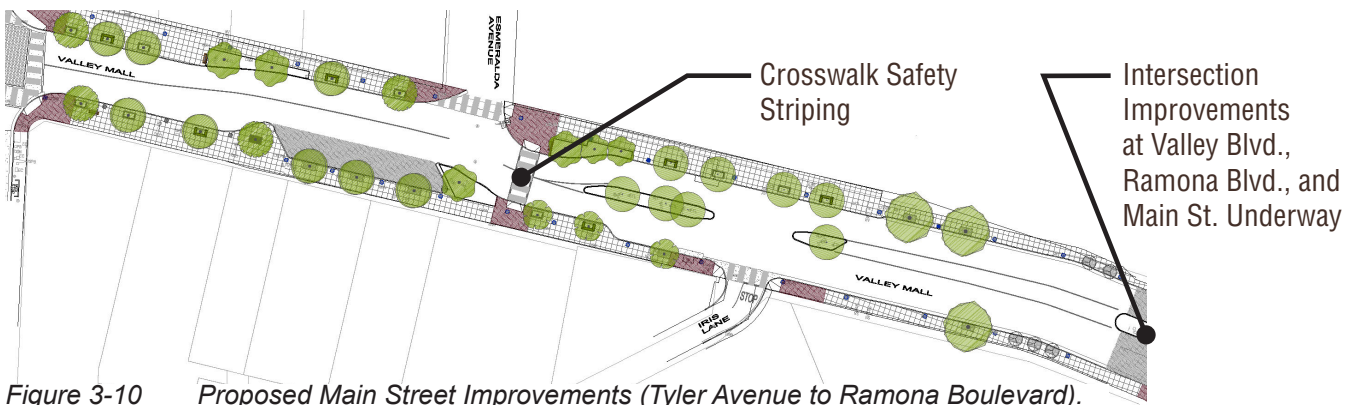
Proposed Main Street Improvements (Tyler Avenue to Ramona Boulevard).
